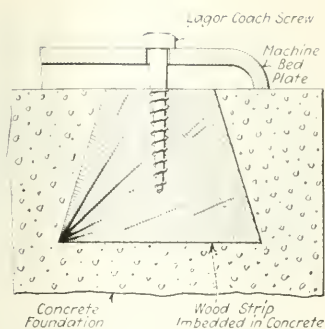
LIGHT MACHINERY SECURED BY LAG SCREWS
